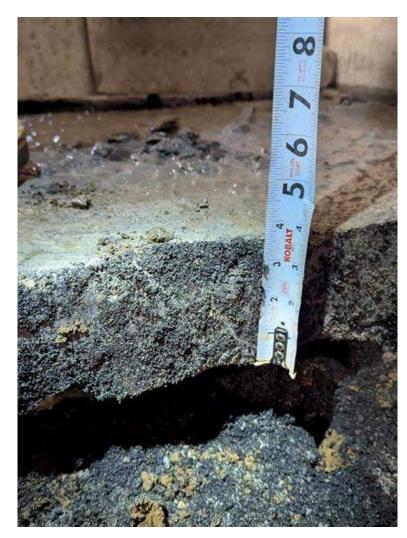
Interior Test Pit TP-4A; view of floor slab thick-
